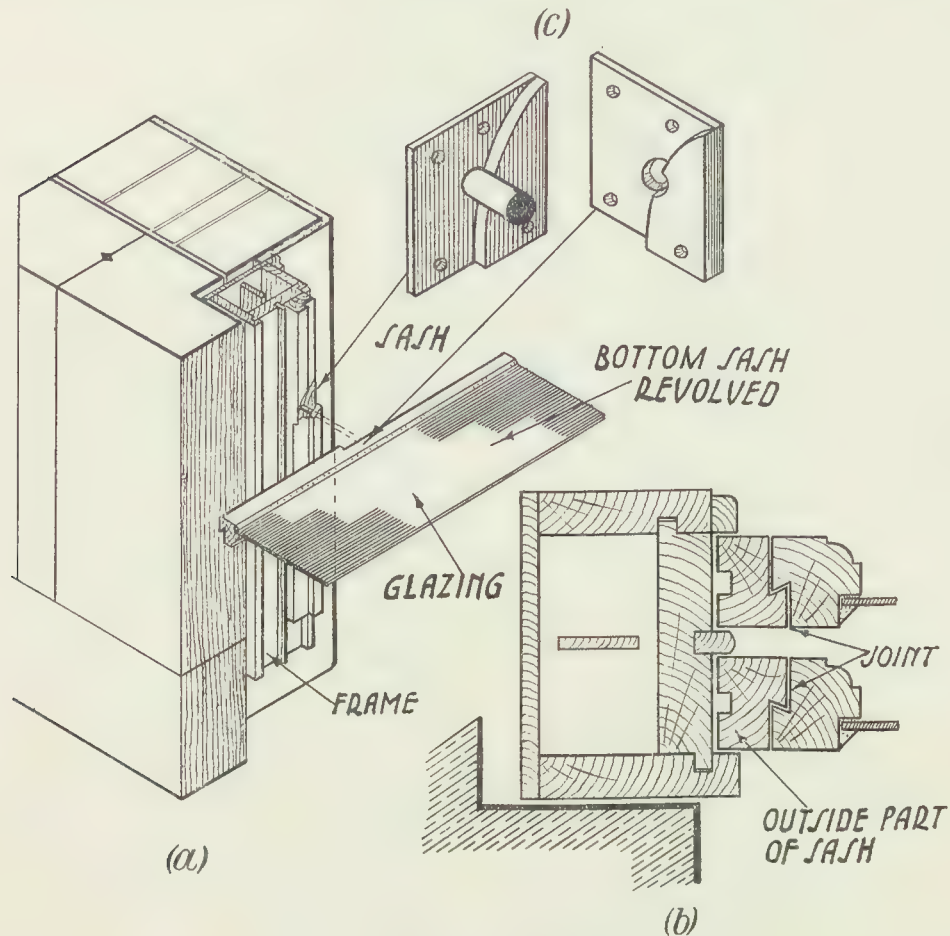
DETAILS OF WINDOW FRAME WITH PIVOTED SASHES
